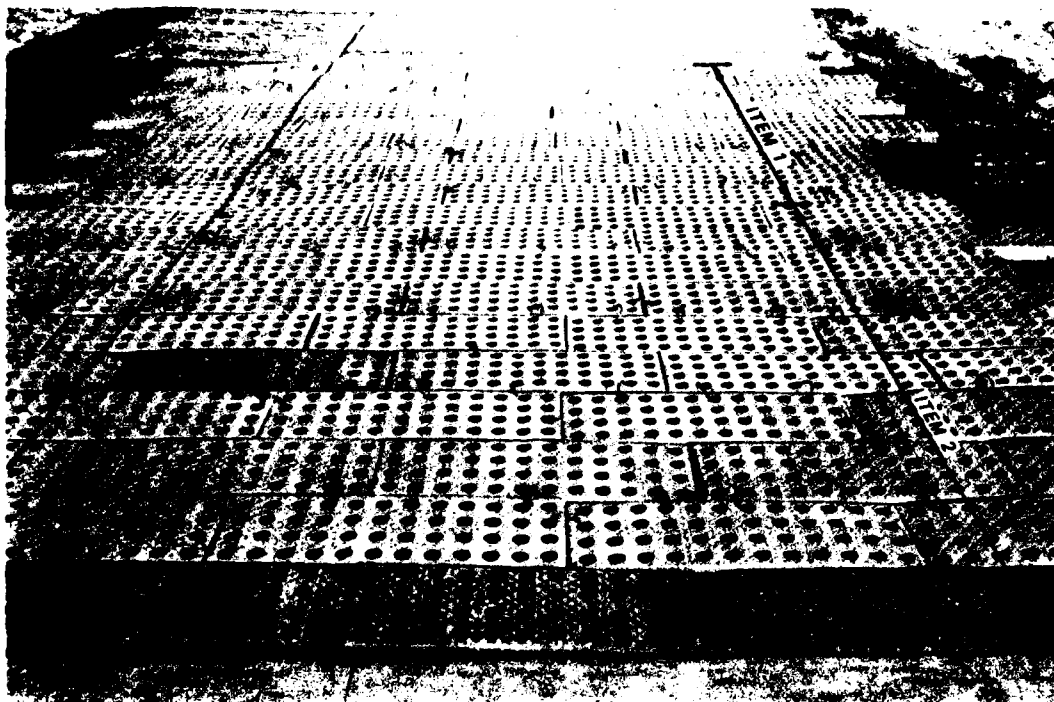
General view of test section covered with Sod Saver Blocks before traffic, test II
